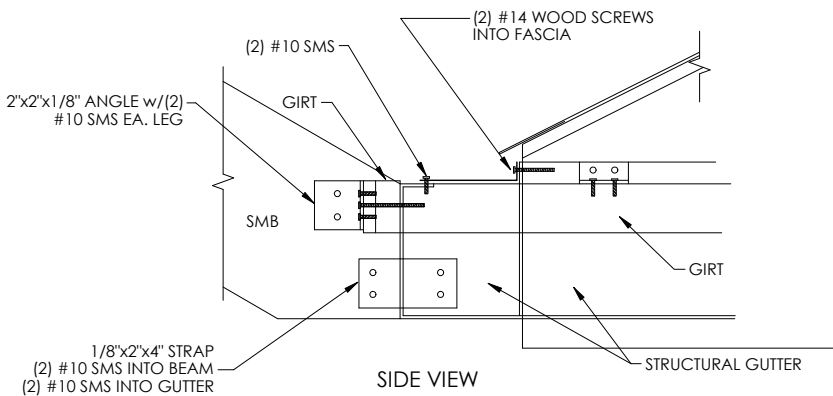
DETAIL "K" GUSSET CONNECTION SCALE: NTS
